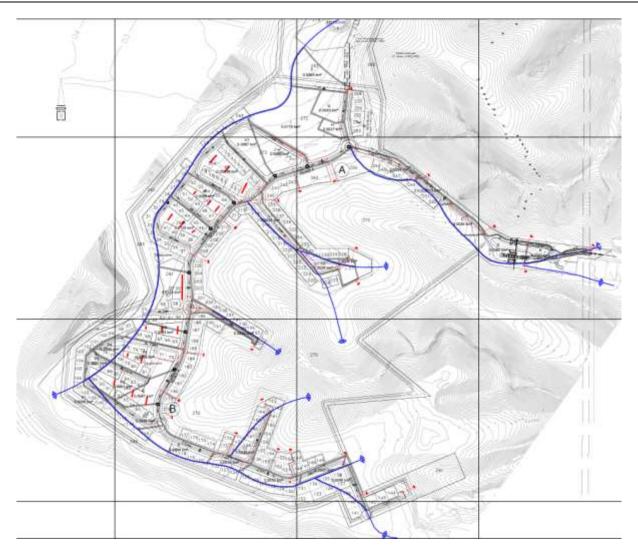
Provisional stormwater layout plan assessed as Alternative 3.
